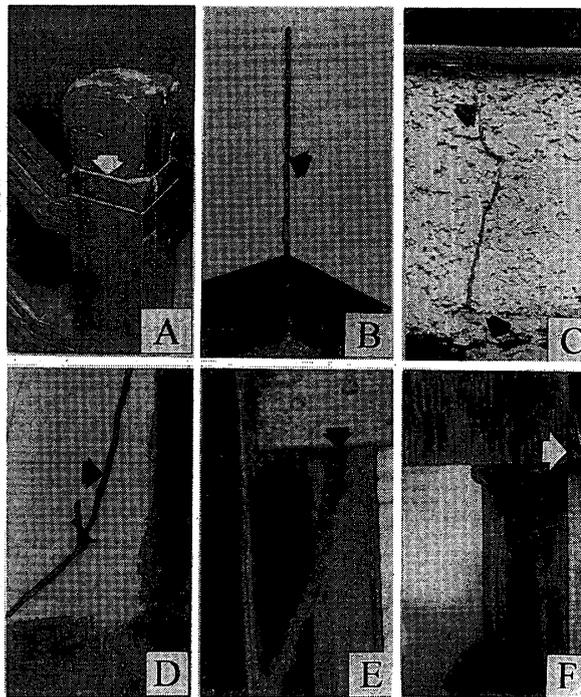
The shelter tube is the typical signs of termite infestation in buildings. A-B : Shelter tube of *Coptotermes gestroi* along post and hand rail of stair (A), and concrete wall (B) in crawl space house type , Bangkok City, C : Shelter tube of *Microcerotermes* sp. exposed along stucco concrete foundation in crawl space house, Nonthaburi Province, D-E : Shelter tube of *C. gestroi* penetrated through cracks from slab floor to column and concrete wall (D) to reach their food source in the upper part (E) in slab on ground house, Rayong Province, F : Shelter tube of *Microcerotermes* sp. along house pole in high pole model house, Saraburi Province.
